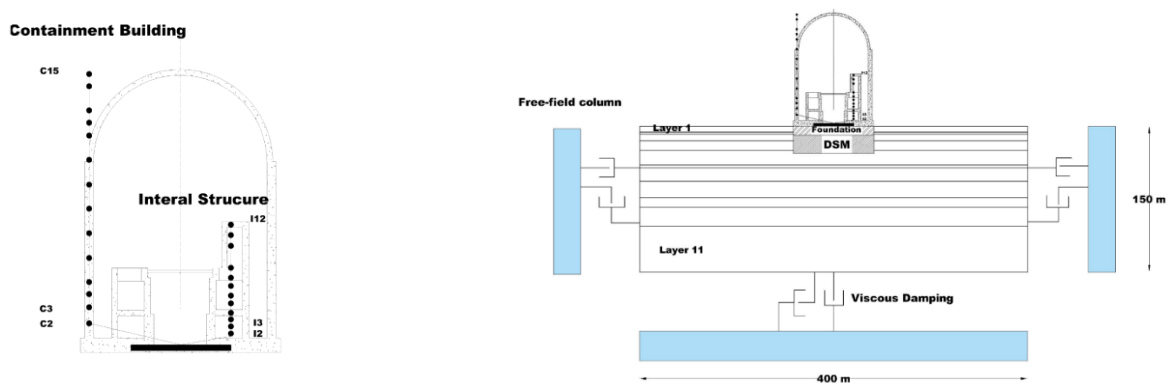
Soil structure system. (a) Stick beam; (b) Elevation view.
